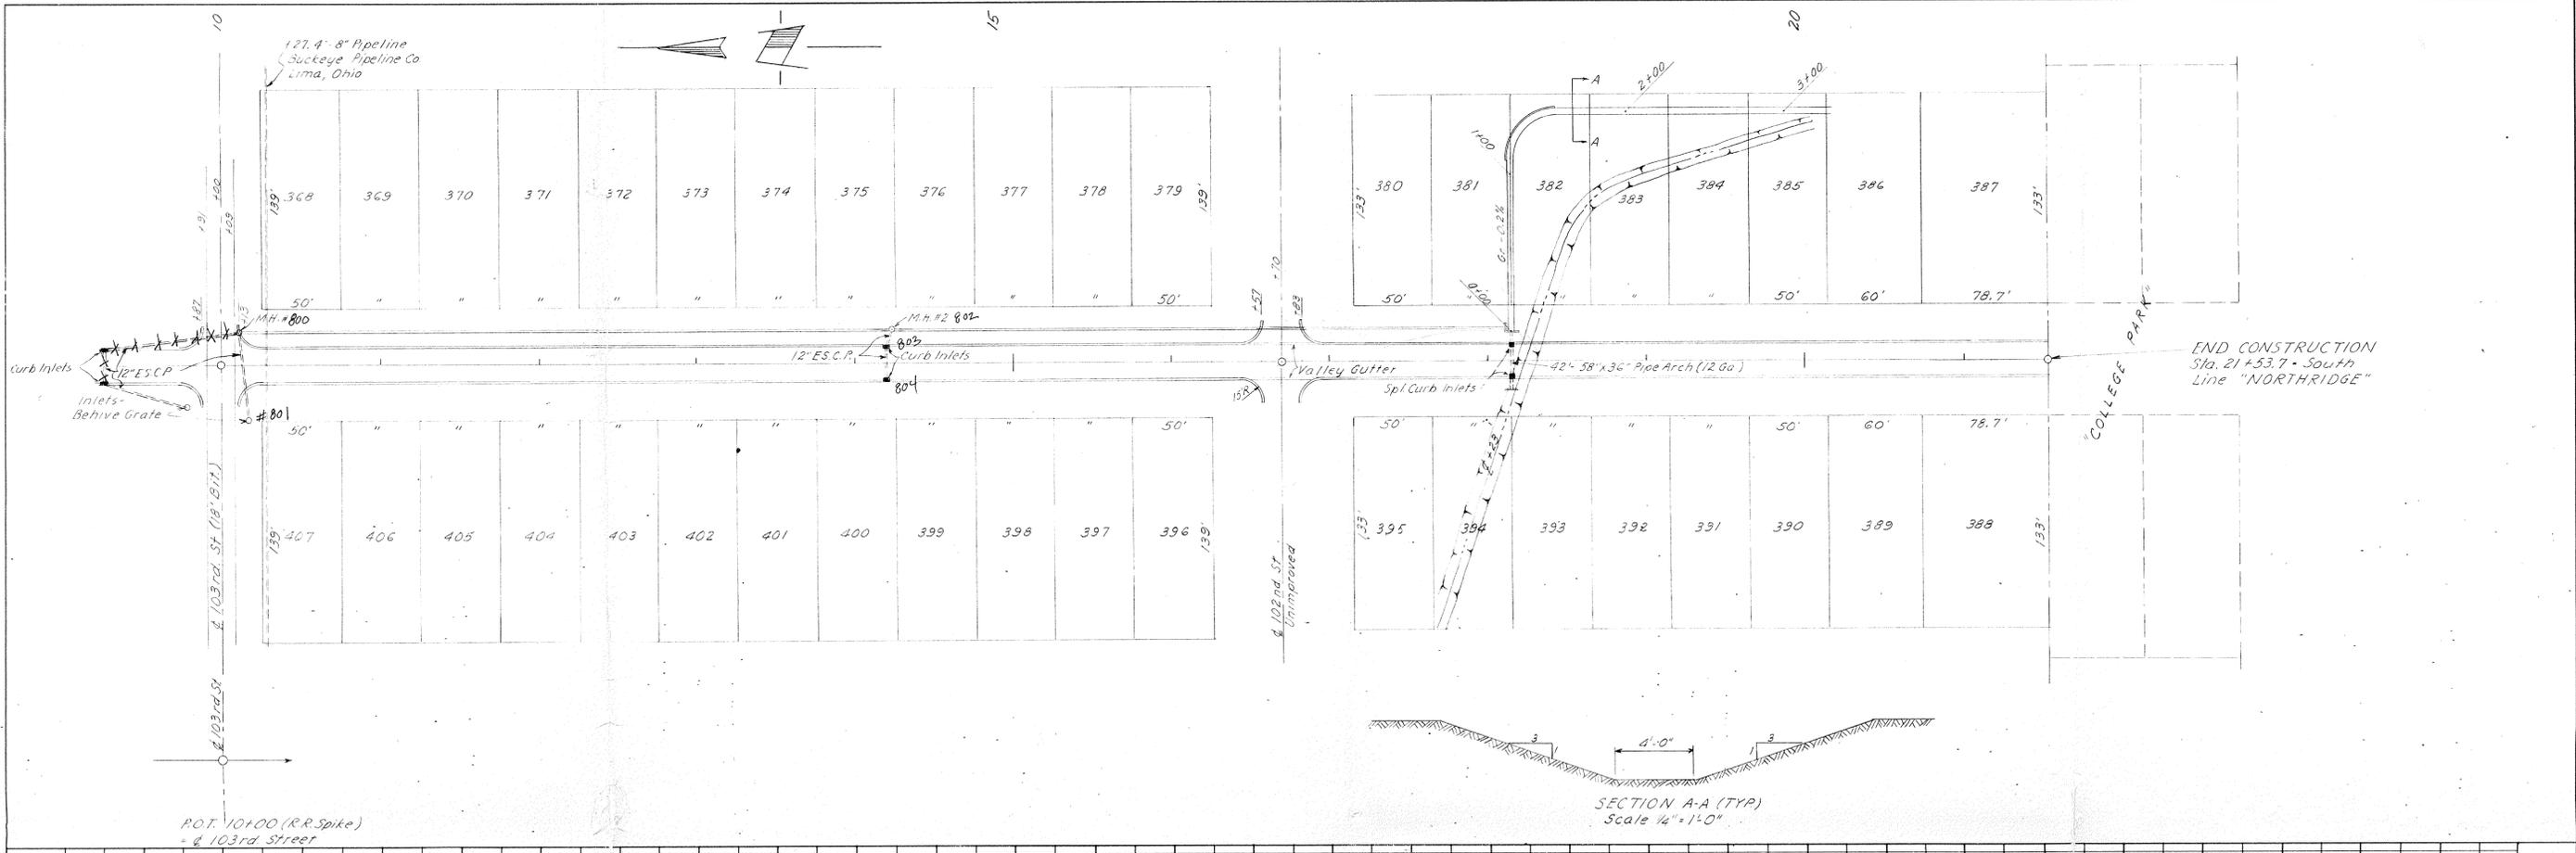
SINGLE PLAN AND PROFILE C. P. R. & R. E. STANDARD
